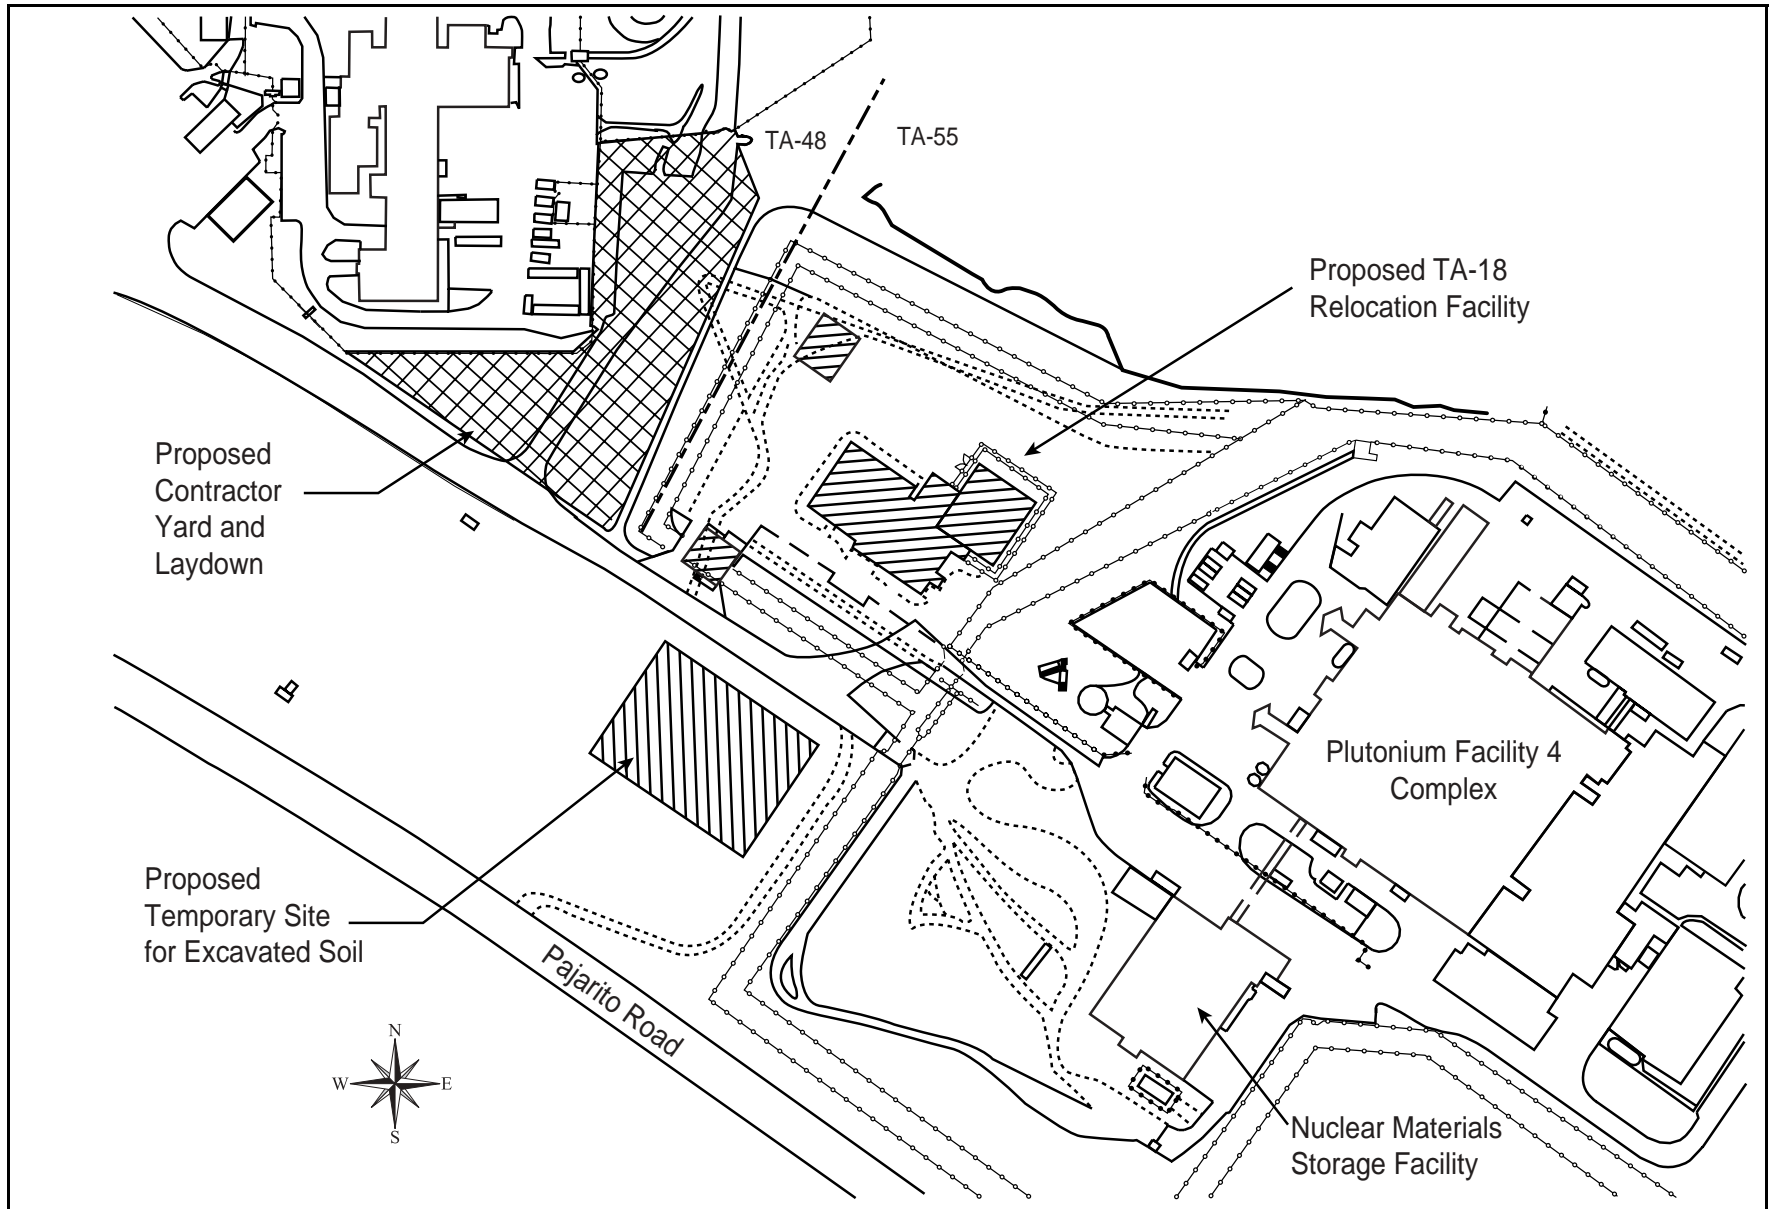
Location of the Proposed New Facility (LANL New Facility Alternative)
